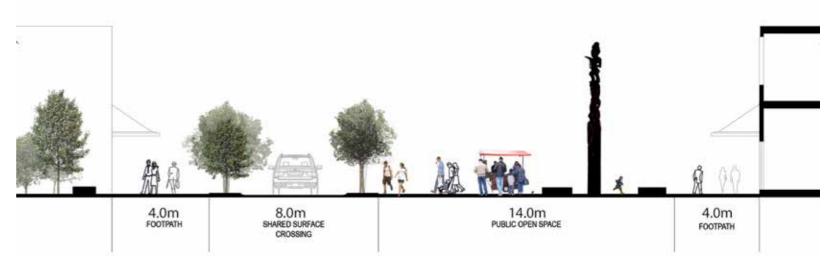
Indicative cross section - corner Jesmond Street and Great South Road - narrowing to one lane and provision of outdoor open space outside the library and southern side of the street
